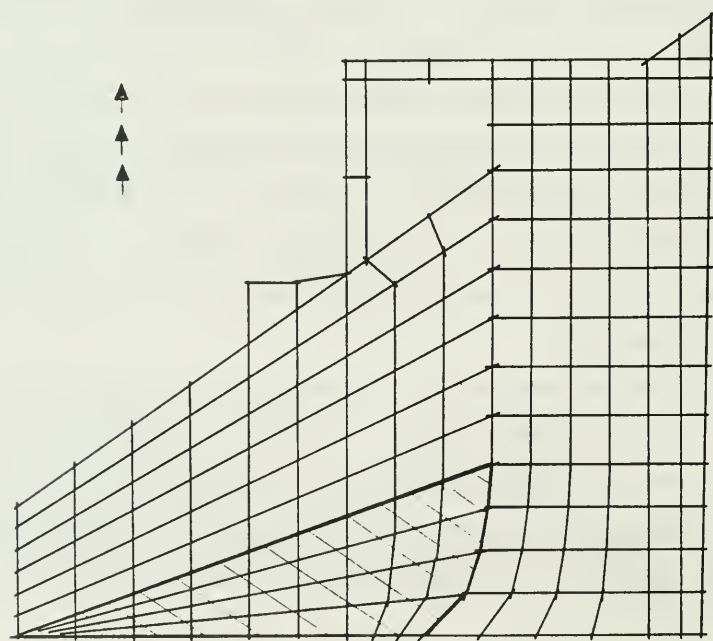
A ELEVATION VIEW OF PIER ELEMENTS
